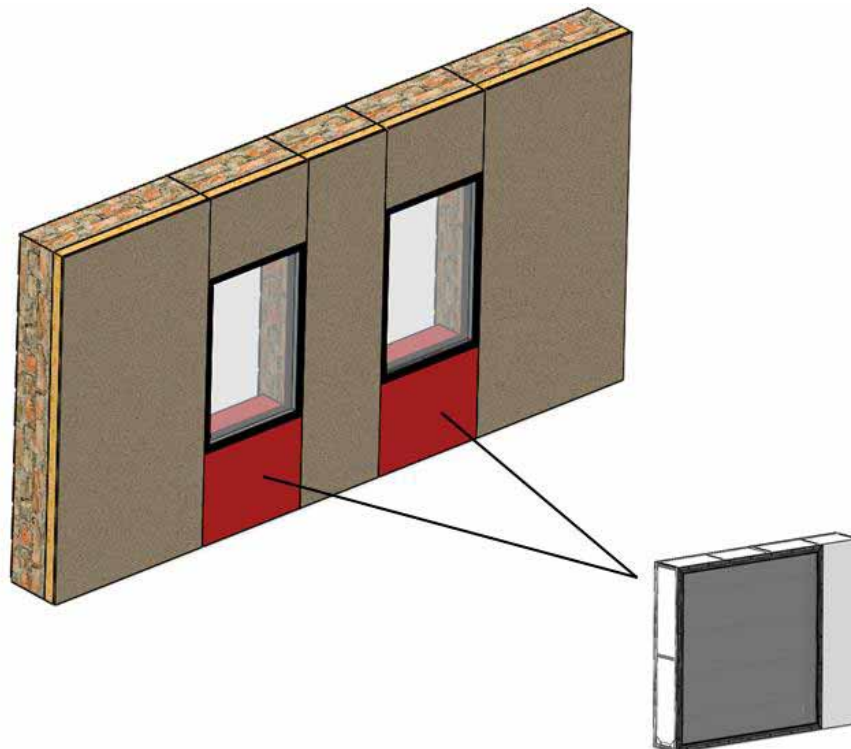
Example for the integration of the solar thermal façade element into the façade of a residential building
